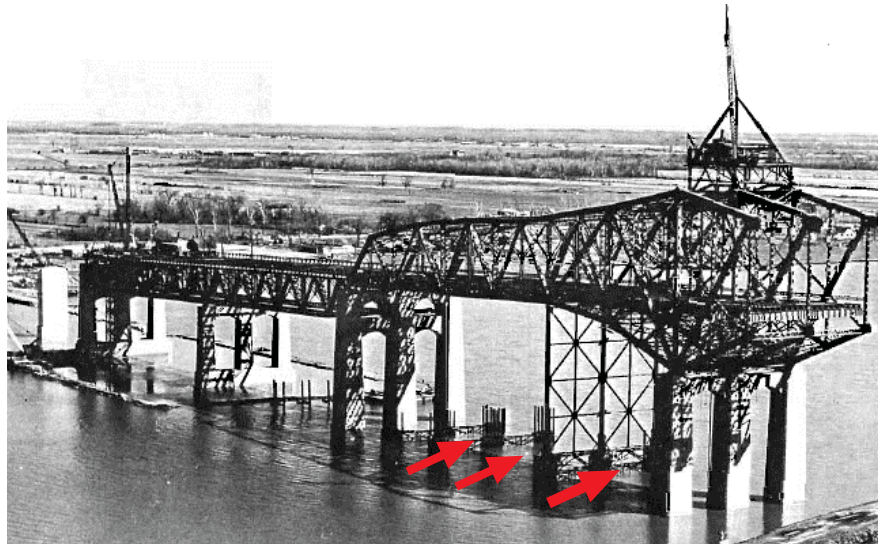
Erection of Champlain Bridge Mainspan, Three Temporary Support Foundations Visible
